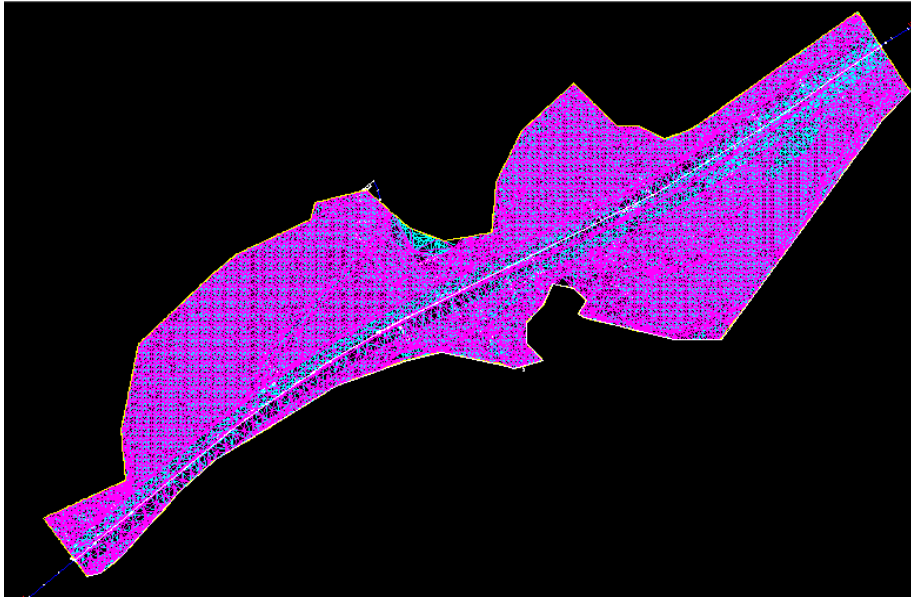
Plan View of Short, Hilly Section Surfaces
